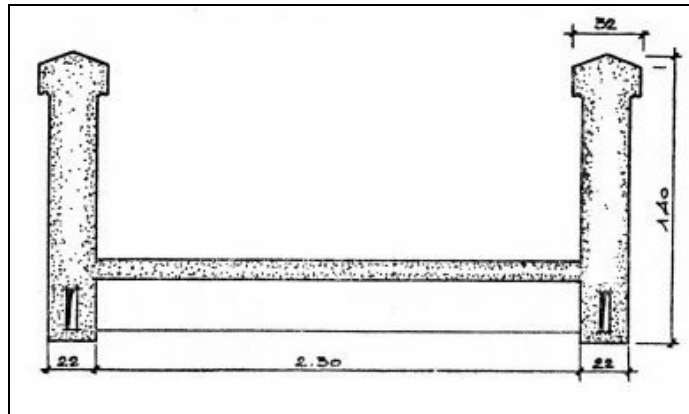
Cross section of the *rue de Gosselies* footbridge (Magnel, 1948)
